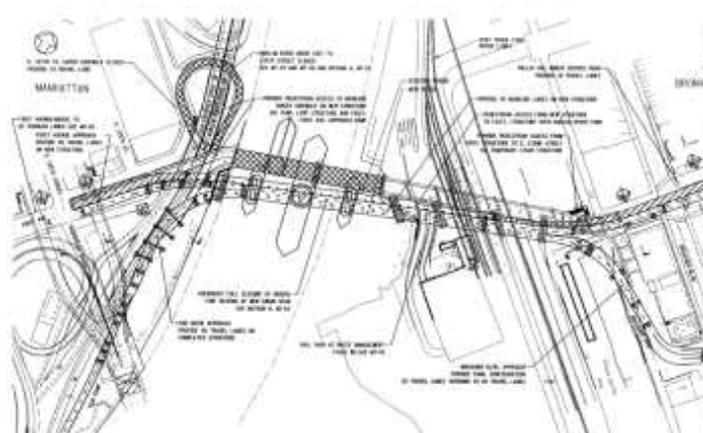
Demolition of the Existing Bridge after completion of the new bridge
